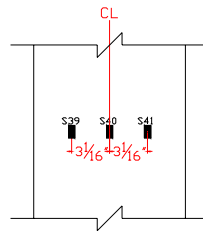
Specimen 1 – Instrumentation (Underside)
